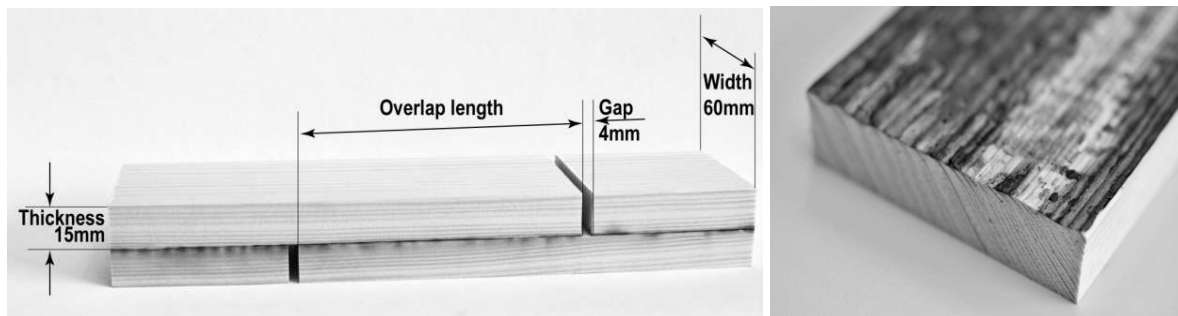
Welded wood joint: specimen (left) and typical failure (right)
